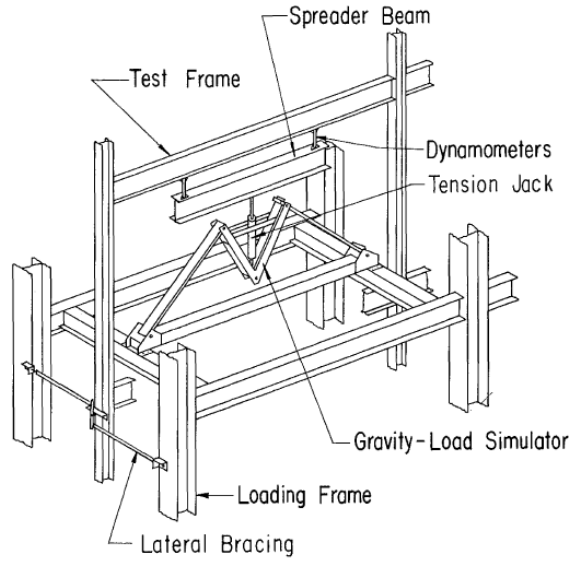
Typical bay loading and out-of-plane bracing arrangement (Yura 1965)
